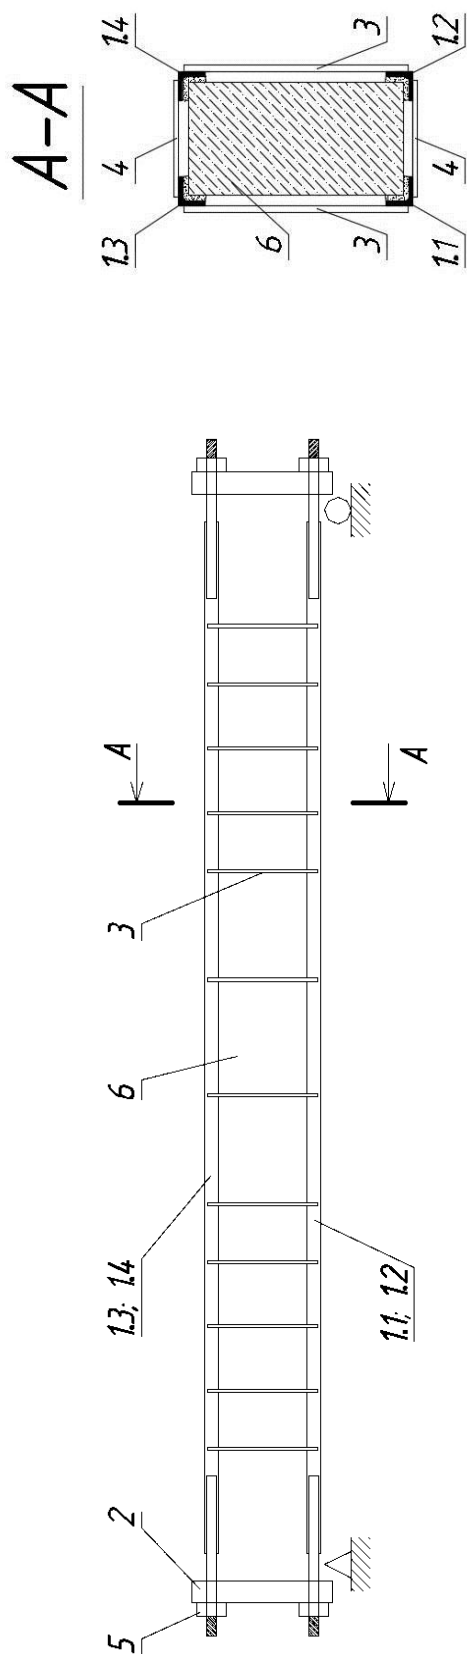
Schematic diagram (P&ID) of an apparatus for reinforcing a conventional curved reinforced concrete structure mechanically damaged by through normal and crossover cracks by means of a prestressed metal holder
